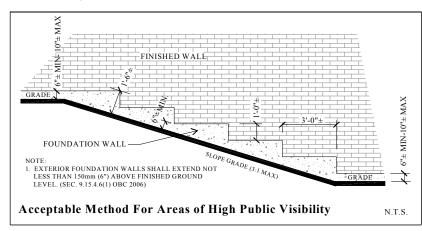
Stepped foundation wall detail for sloped grade conditions with high public visibility
